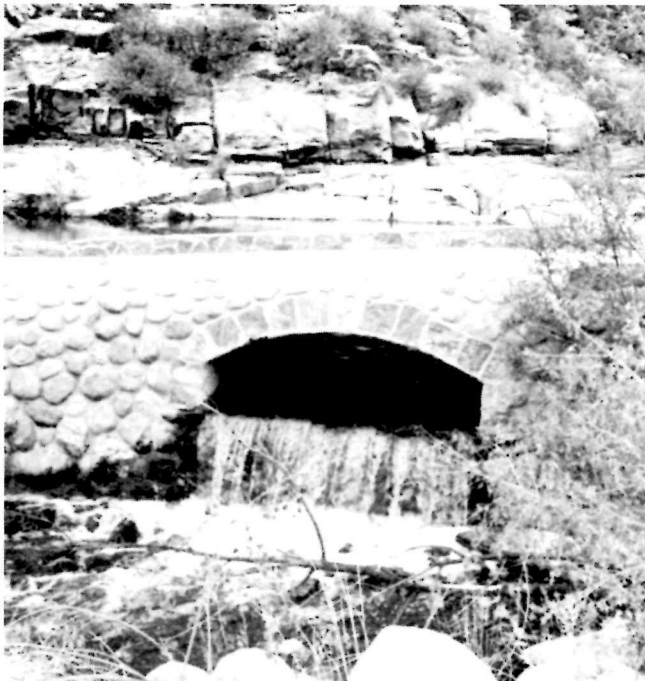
Stone bridge and culvert, Sabino Canyon Recreation Area, Coronado National Forest, AZ. (Photo by Kim Lakin, 1982)
